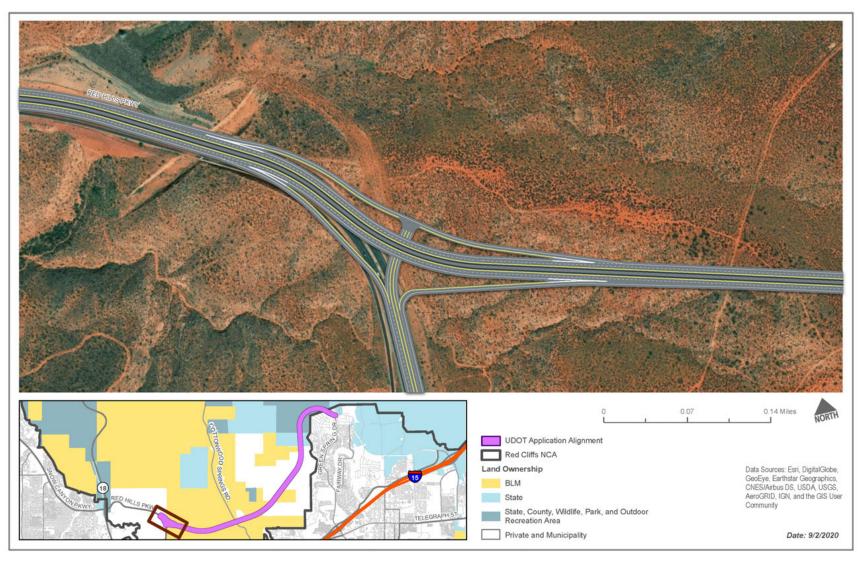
UDOT Application Alignment Plan View (1 of 9)
